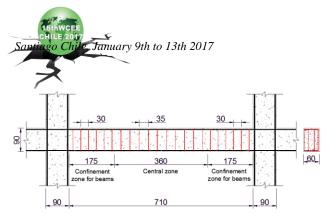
Layout of non-ductile confinement for beams, 15-story model, α =0.25, β =0.50, units: cm
